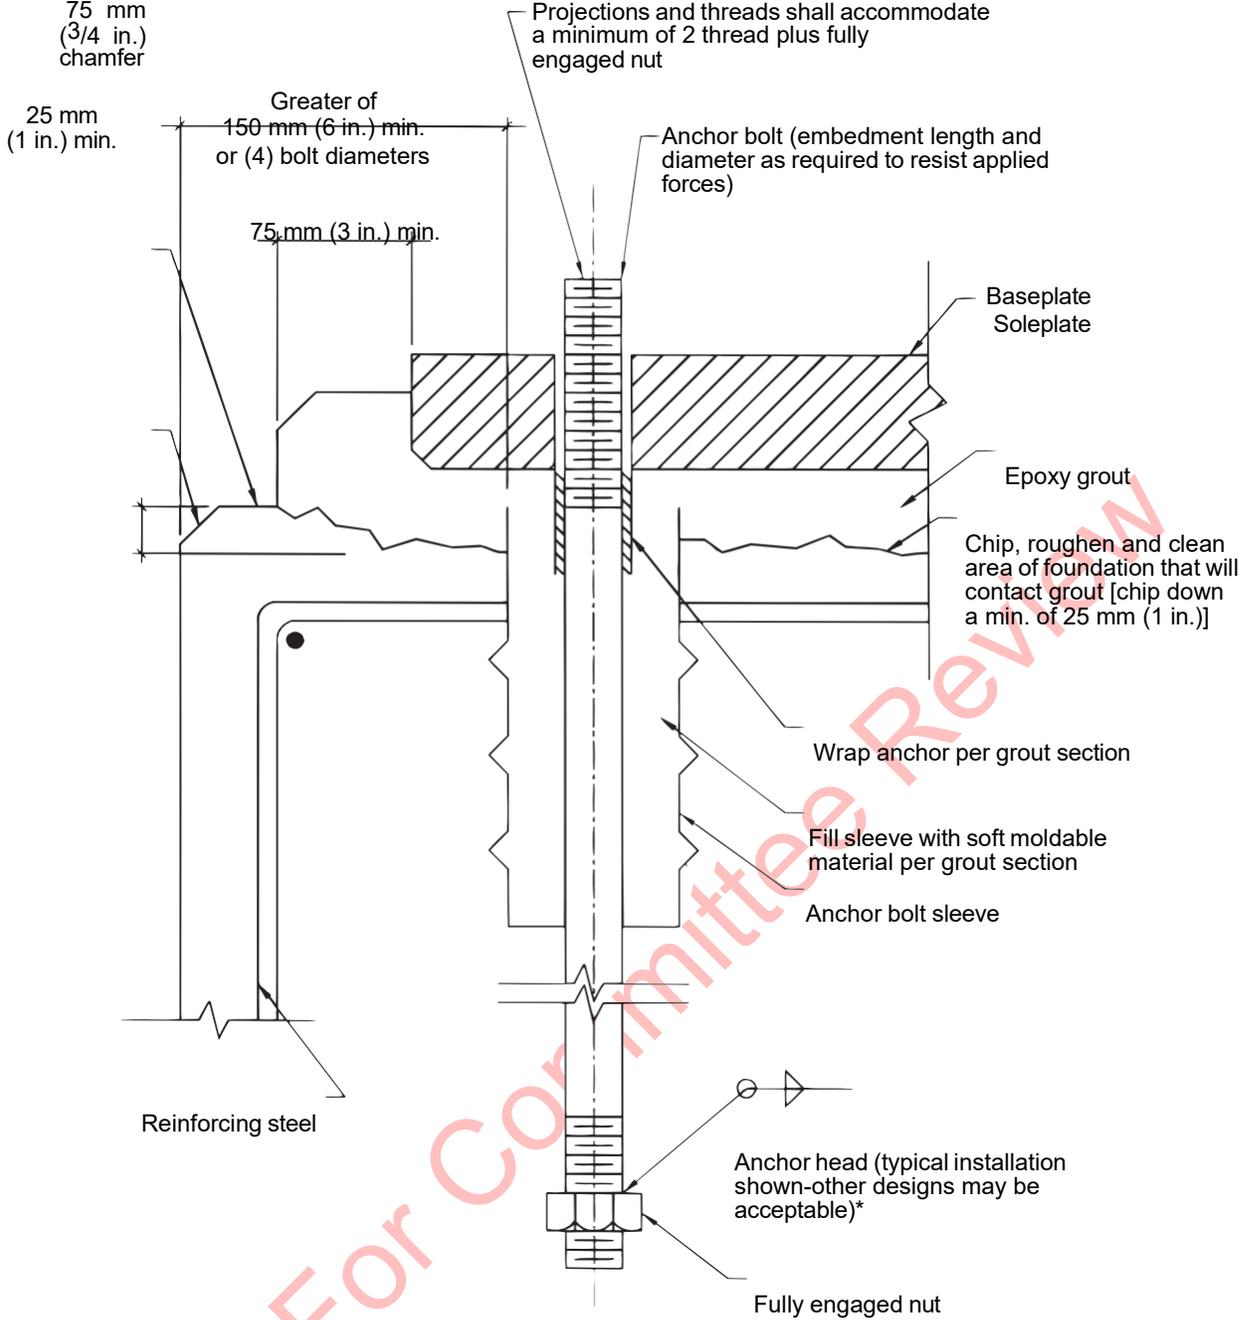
Typical Anchor Bolt Detail—Option 1, Grout Pour Not to Edge of Foundation
